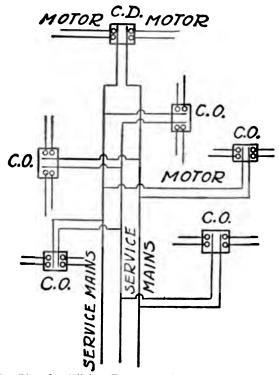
Plan for Wiring Factory Building on the Three-Wire System.
